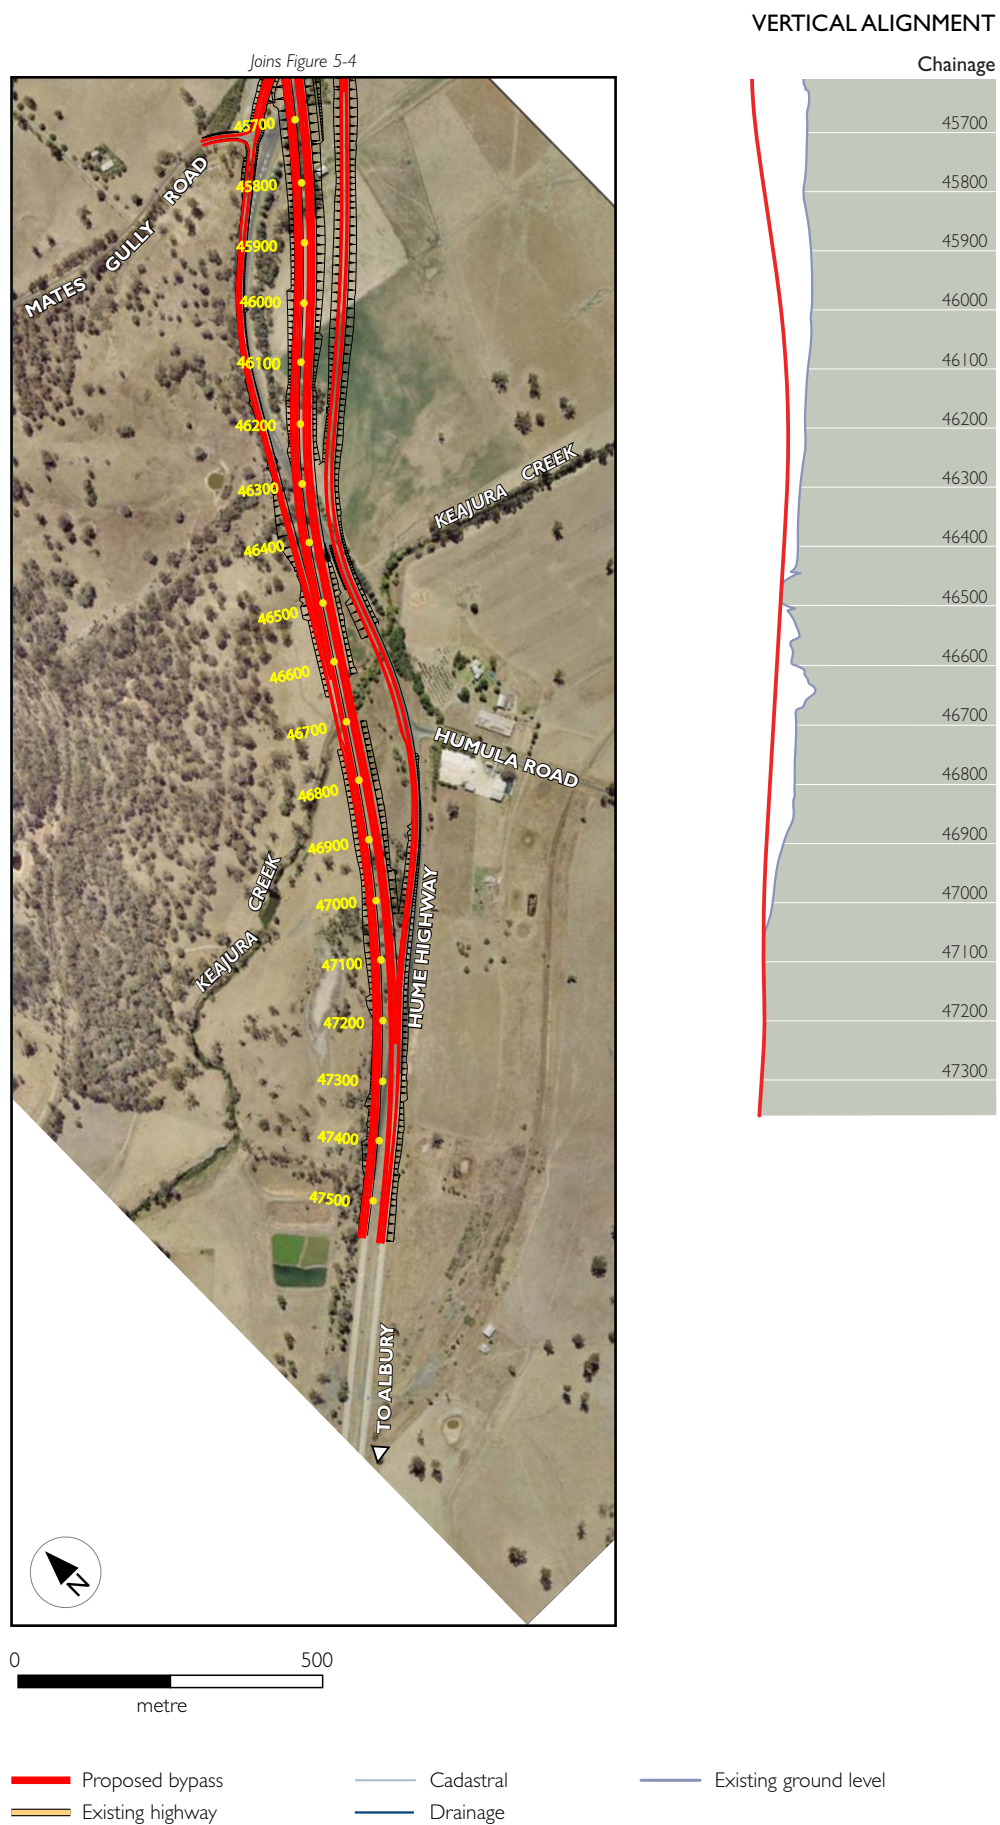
Concept design horizontal and vertical alignment (southern section)
